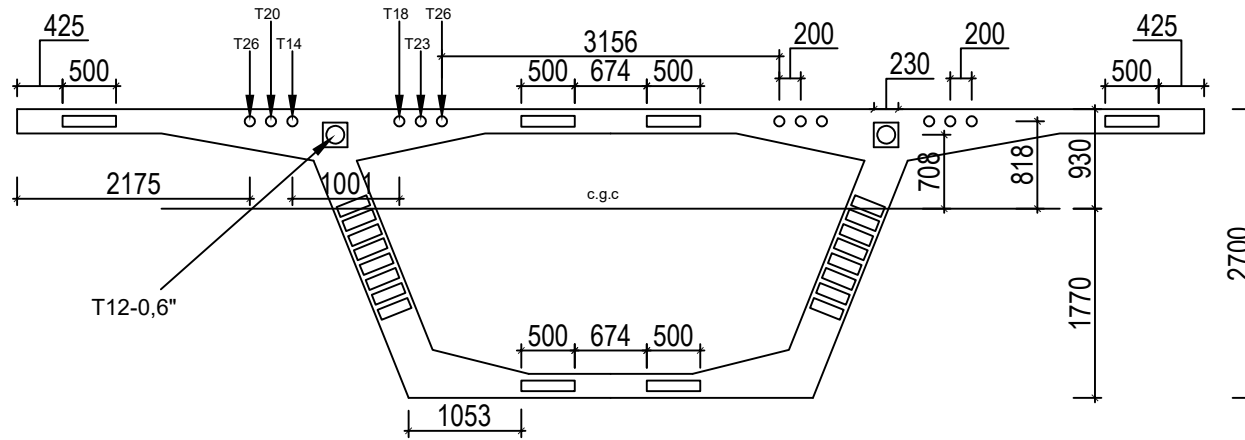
DETAIL BOX GIRDER SEGMENT 2 & 2L (S2 & S2L)
